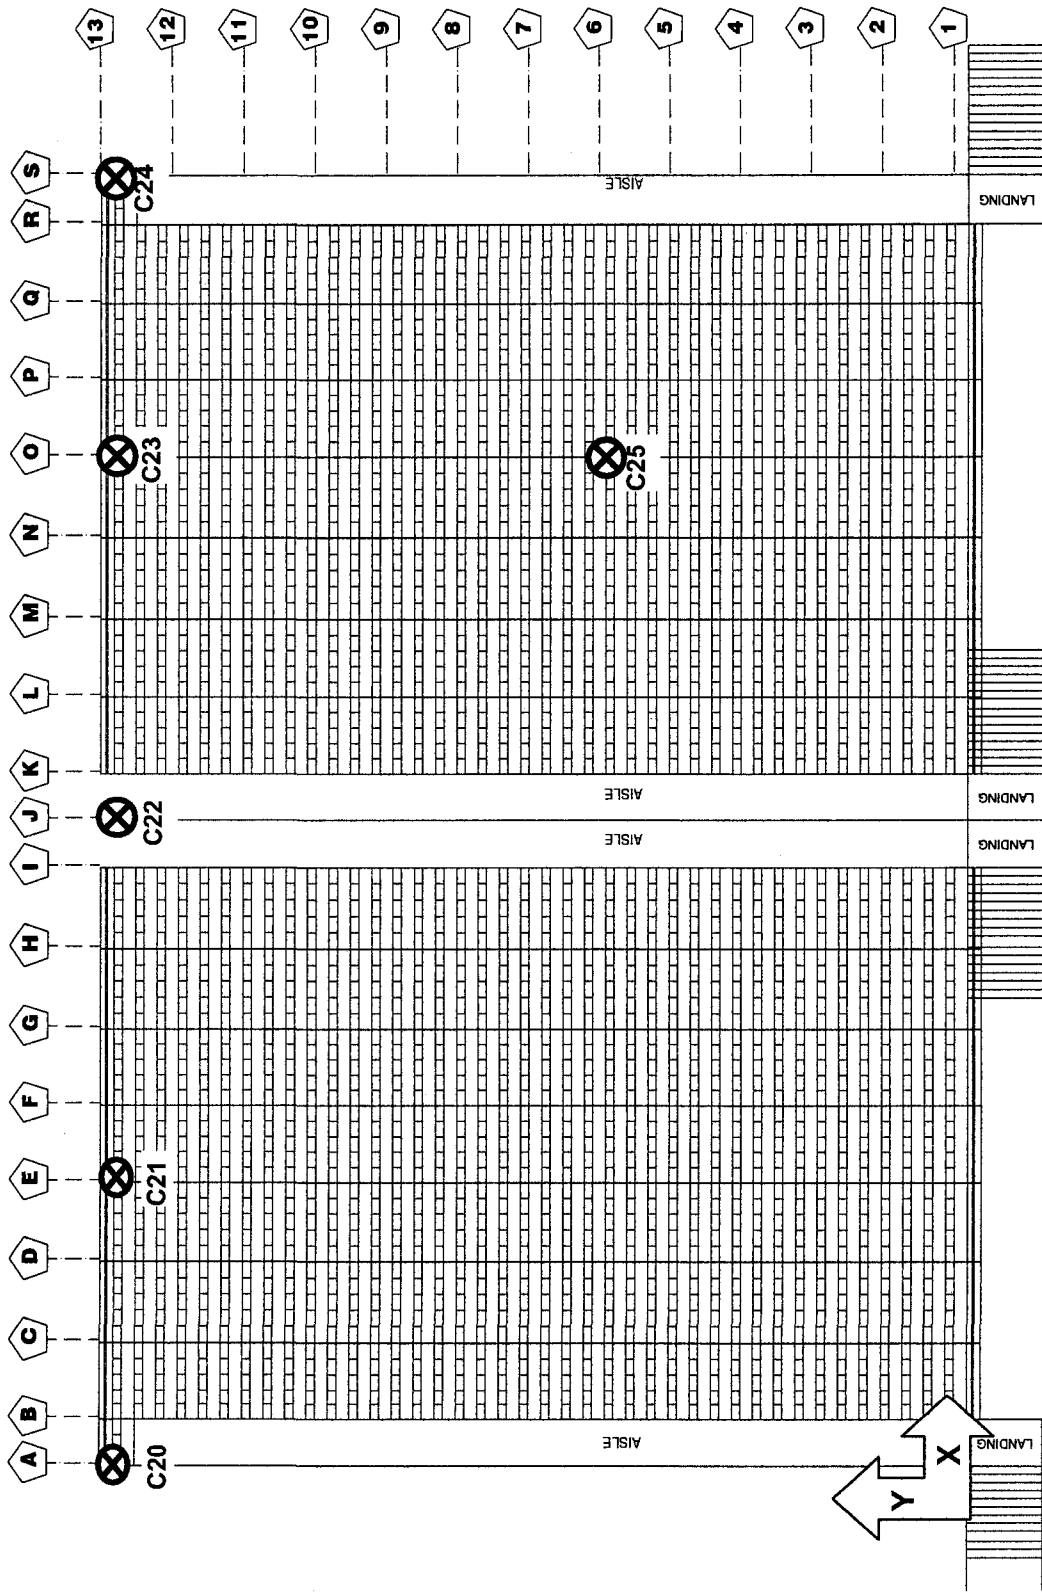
Location of cable transducers measuring vertical displacement on plan view of grandstand
